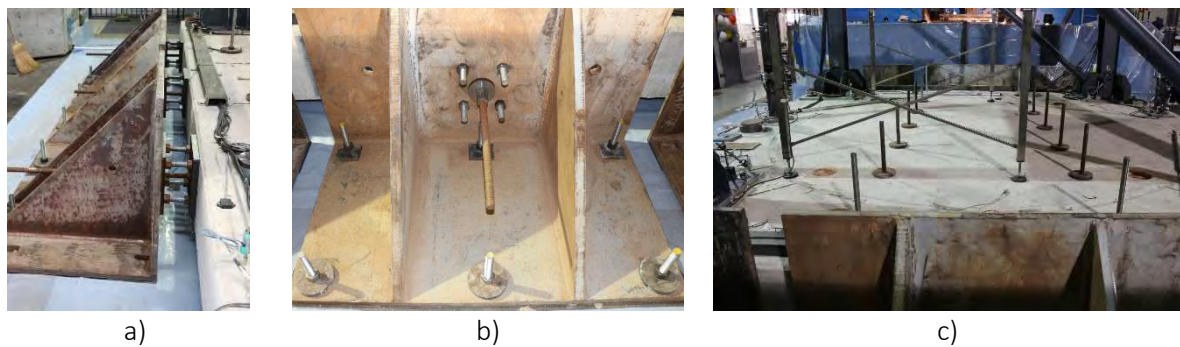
a) Steel support, b) Anchorage of the steel support, c) Through anchors to the shaking table
